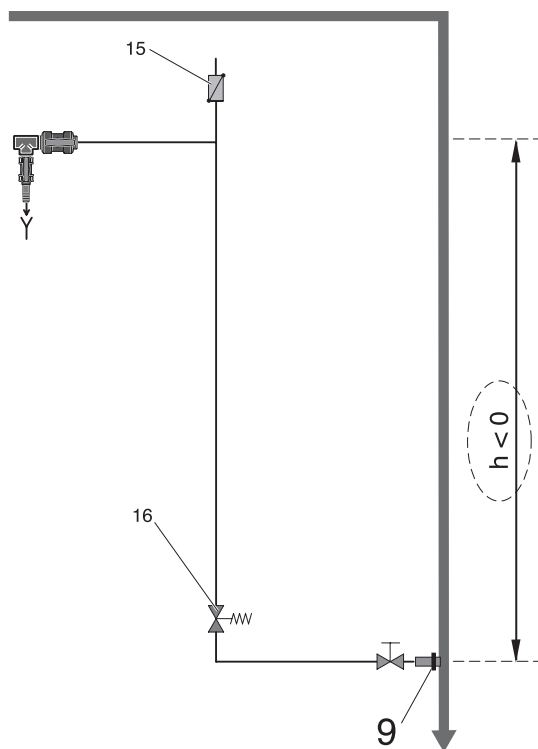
Hydraulic environment of the bleed valve (detail from Fig. 6)
